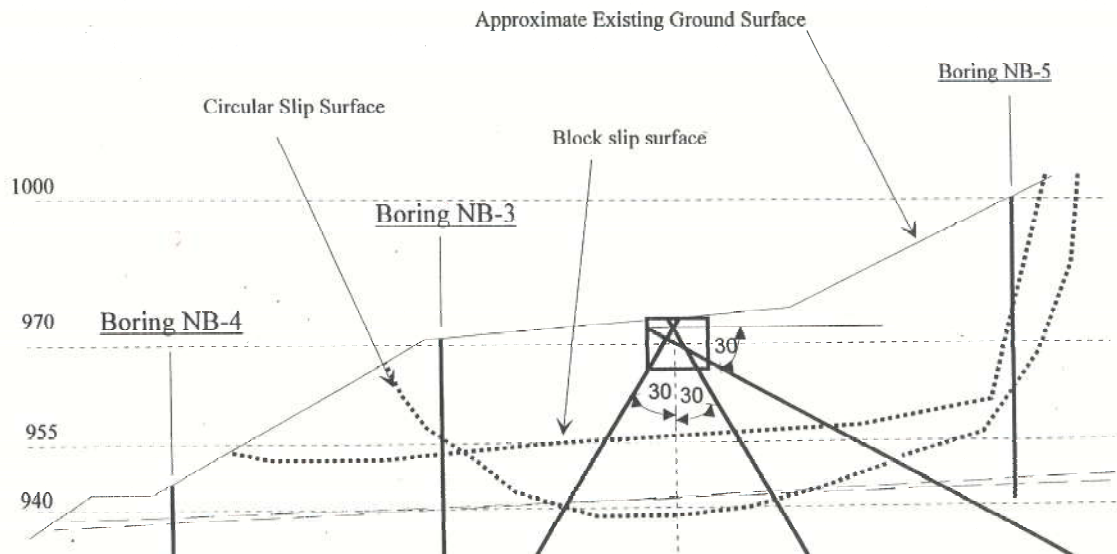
Typical Section of Micropile and Ground Anchor Wall at SUM-271 (after Liang, 2000).
